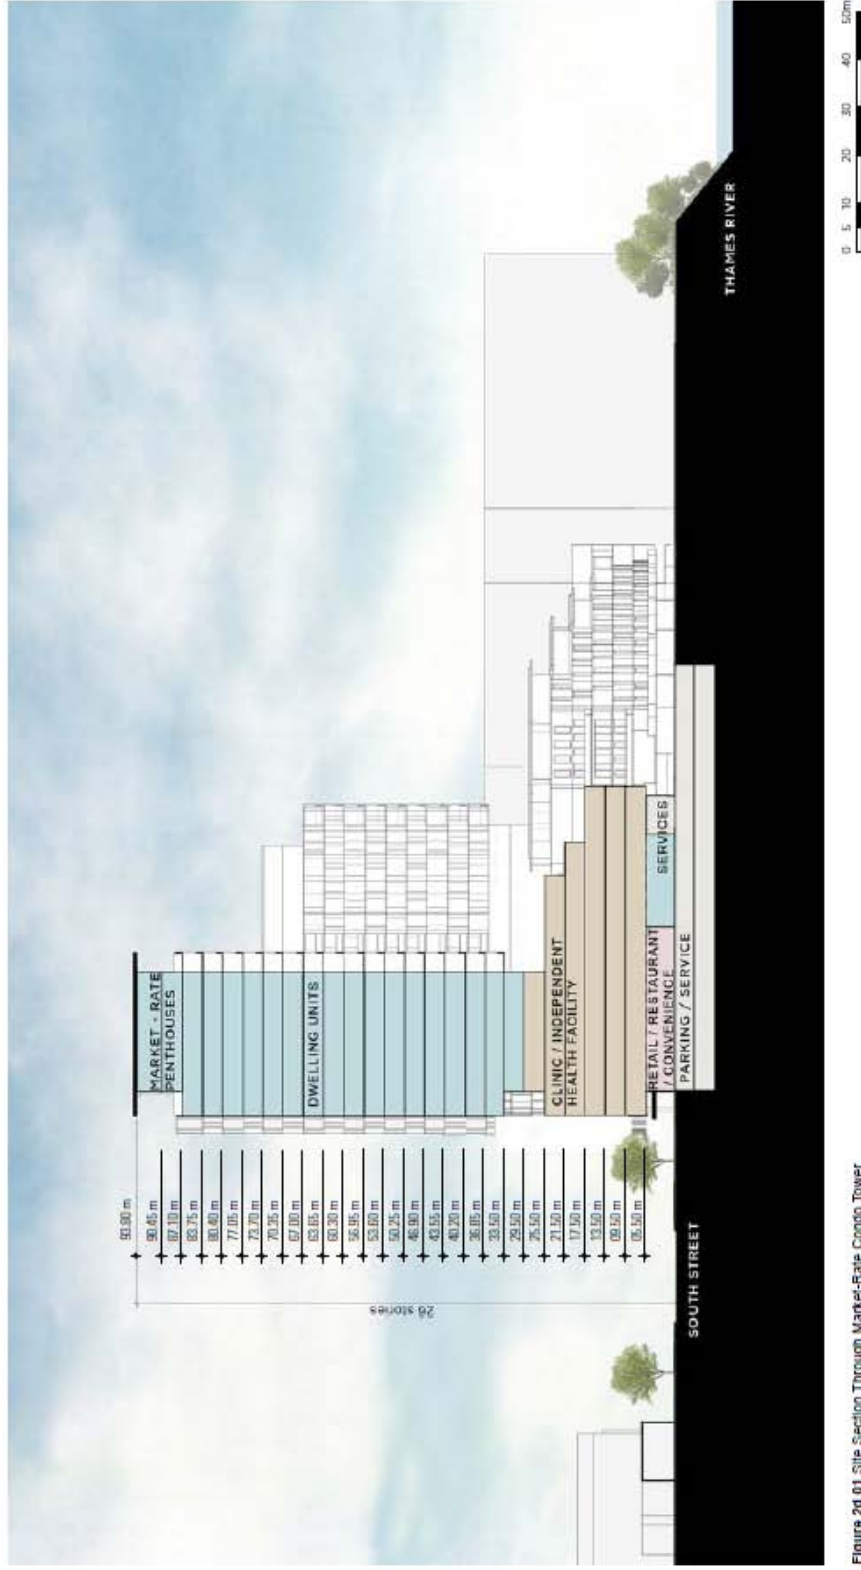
01 Site Section Through Market-Rate Condo Tower
